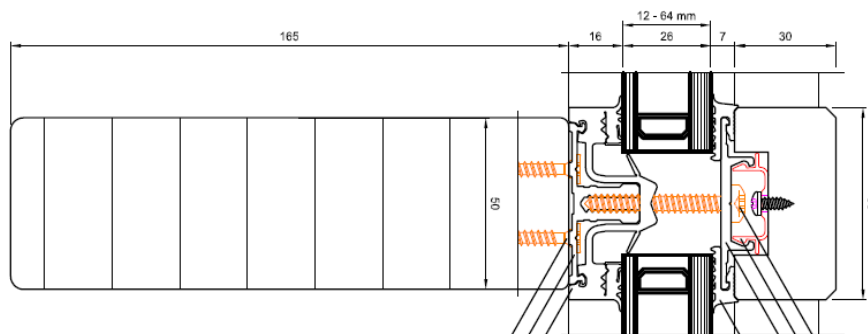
Glued-Laminated-Timber mullion and transom system (horizontal section)
